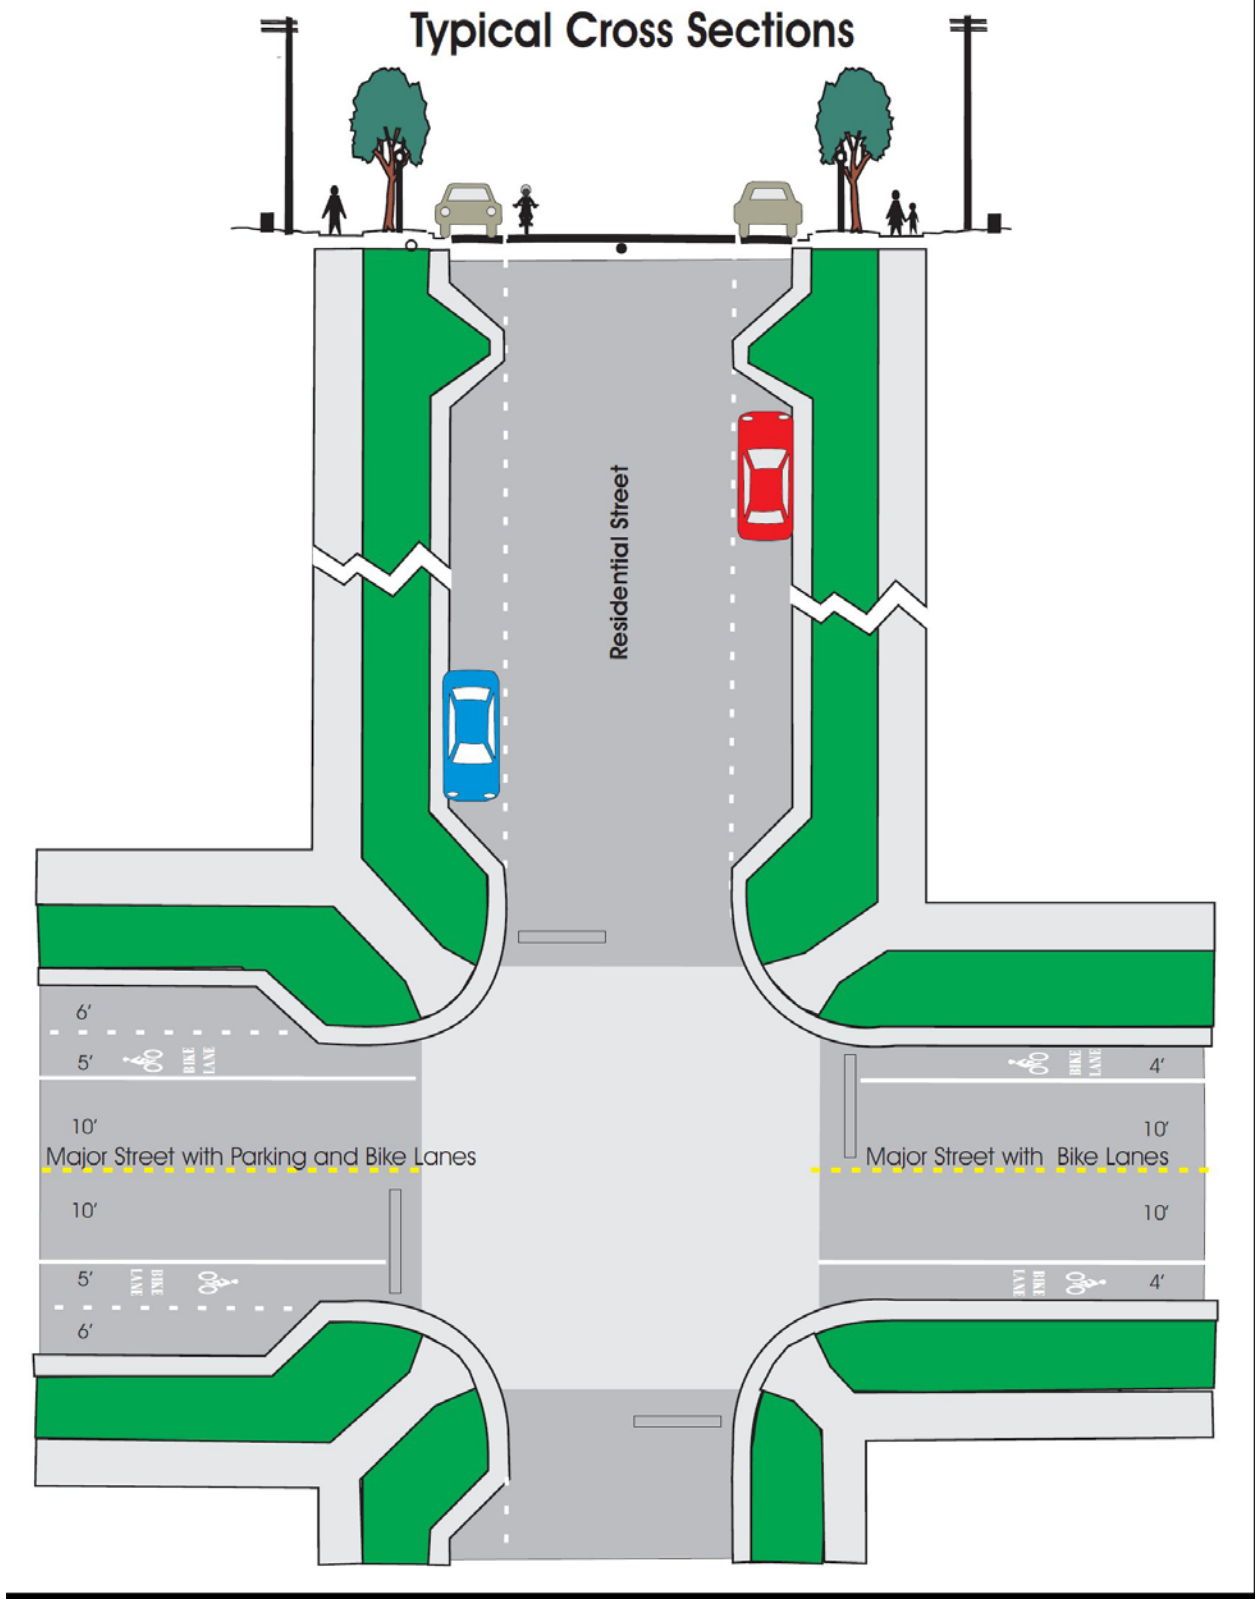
100(B)(2): STREET CROSS SECTIONS
